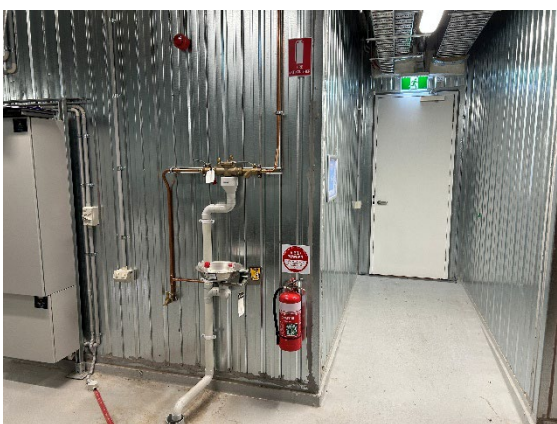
Eye wash and fire extinguisher in the Level 10 Plant Room.
